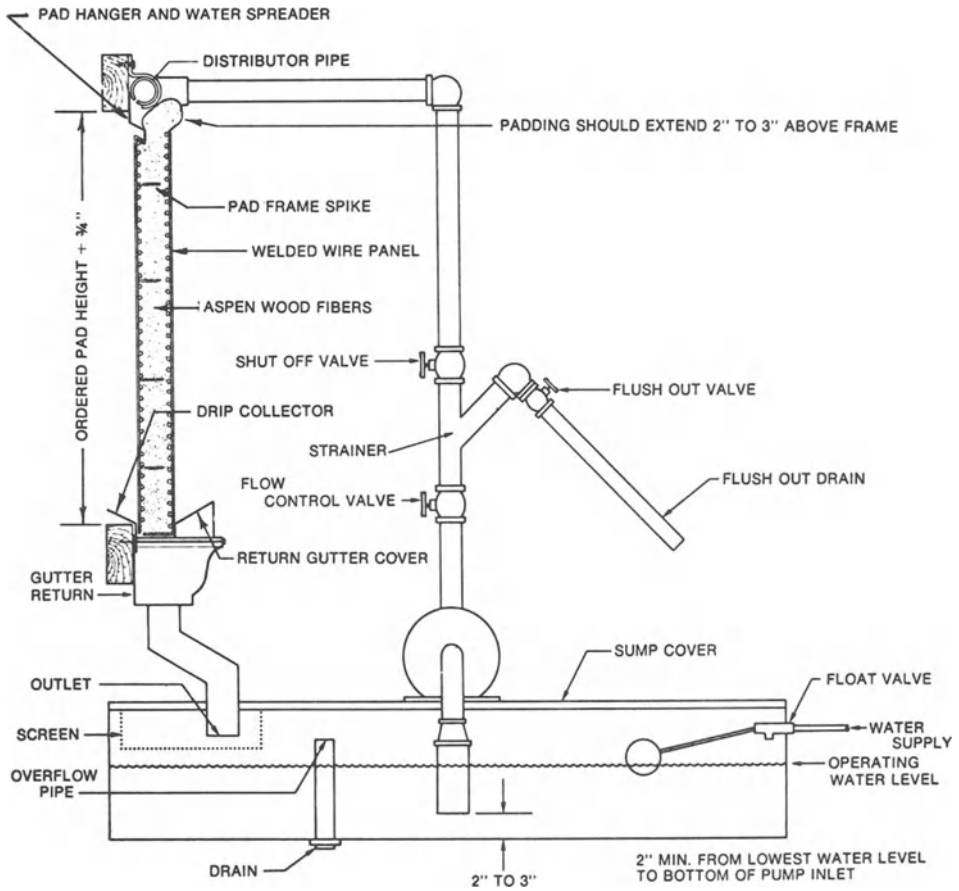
Typical evaporative cooling pad system. Aspen pad system. (Courtesy Acme Engineering)
